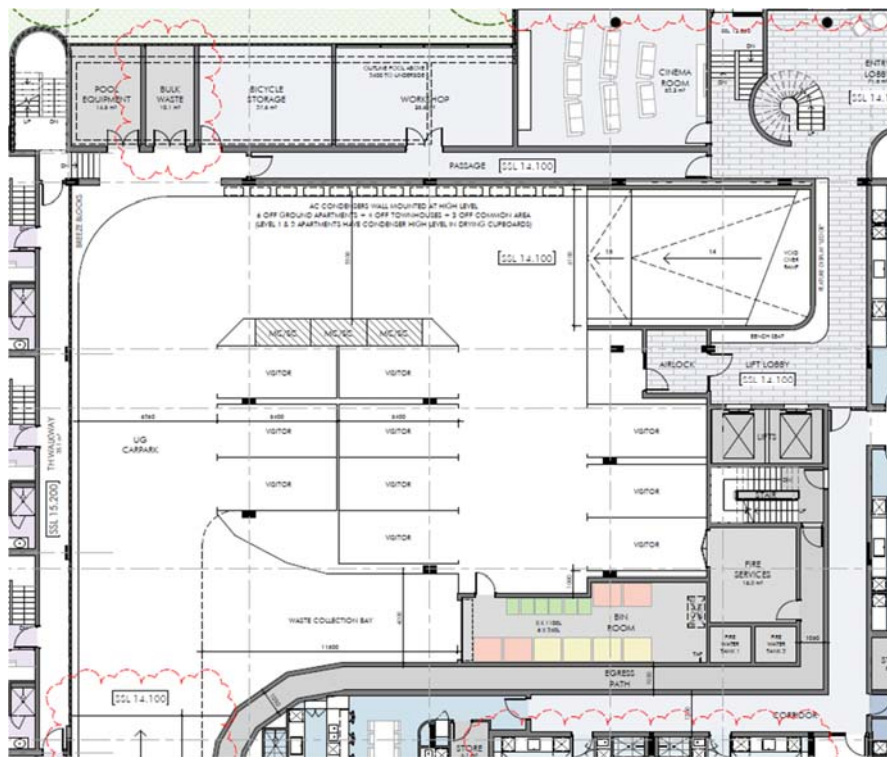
UPPER GROUND FLOOR CARPARK AREA
